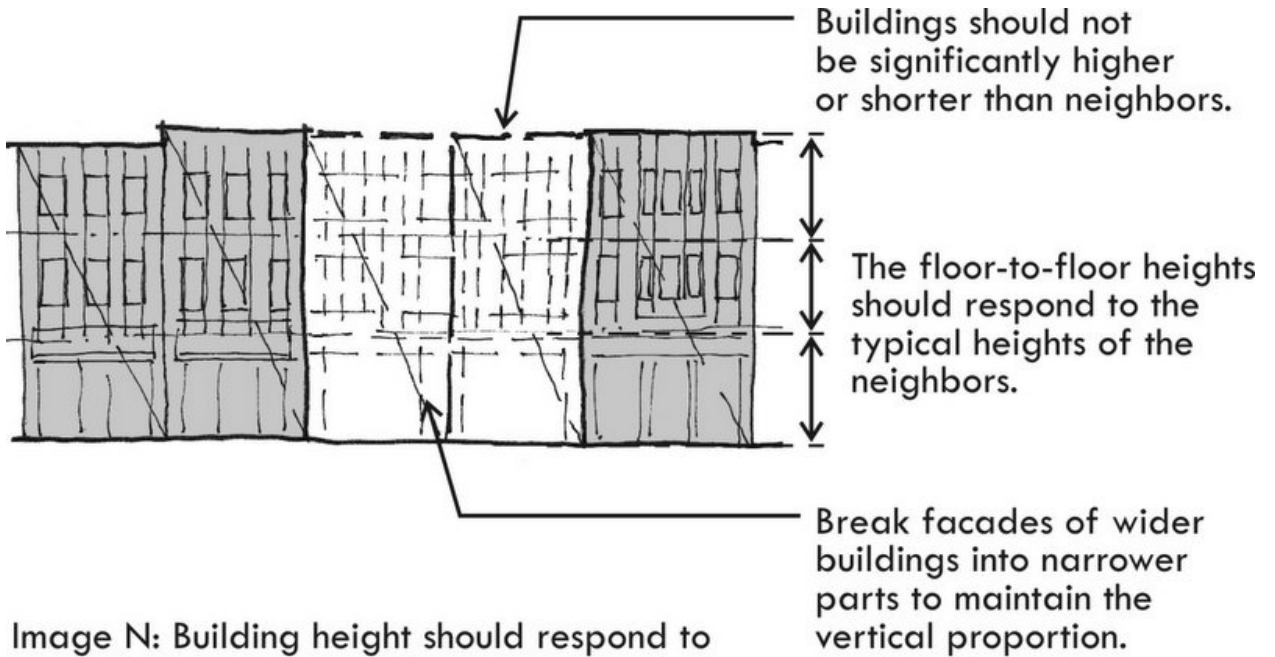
Image N: Building height should respond to immediate neighbors and the streetscape. The facade should have a vertical proportion, even if the building lot is wider than typical.
